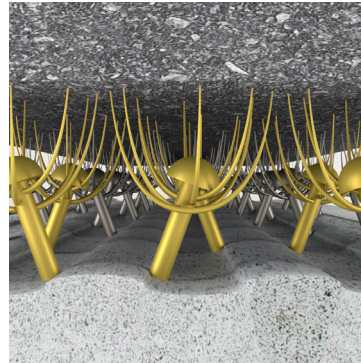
toSystain R façade grip fixing system with mushroom-shaped heads and loops. (Oswald, 2024)
